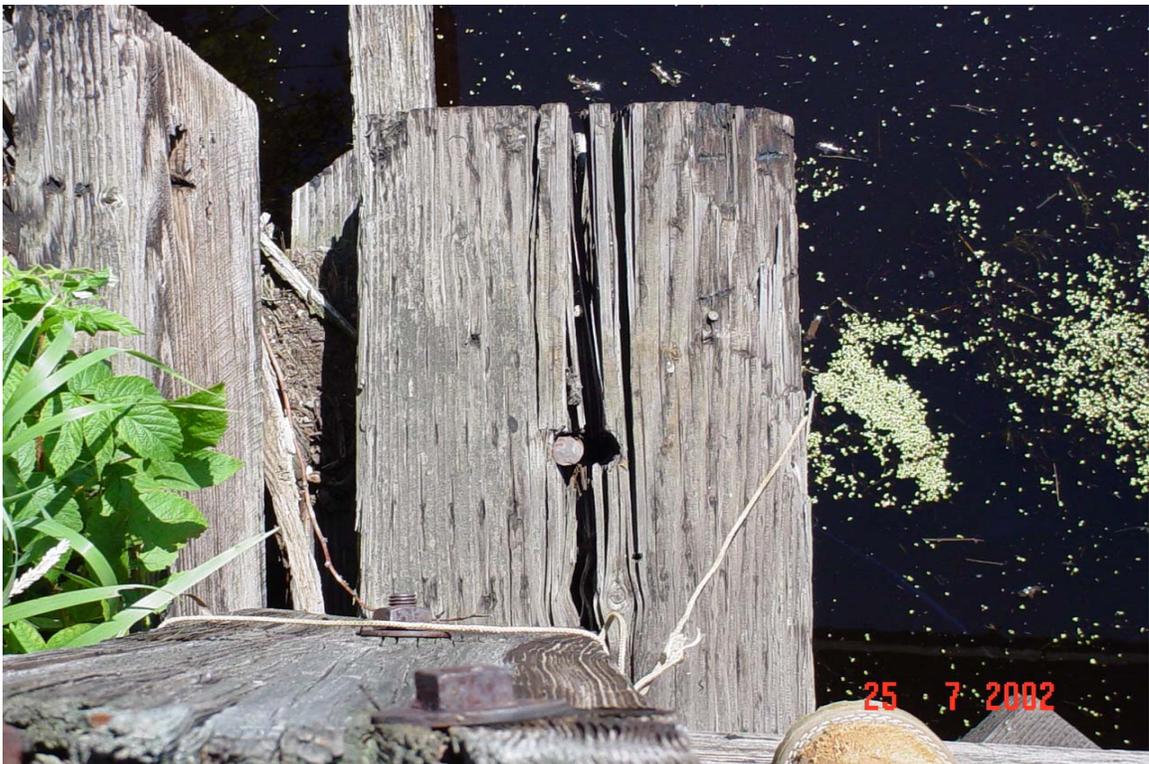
View of the 4th Pile in From the Downstream End of the West Abutment, Looking Southwest.
